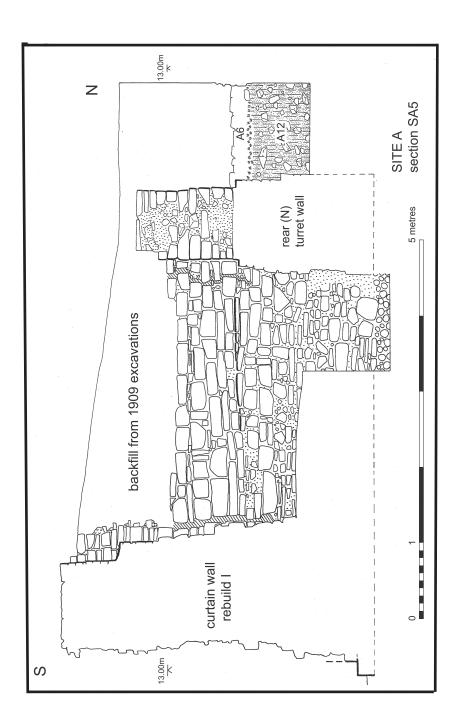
Site A. Elevation of east face of the west wall of the corner turret.
